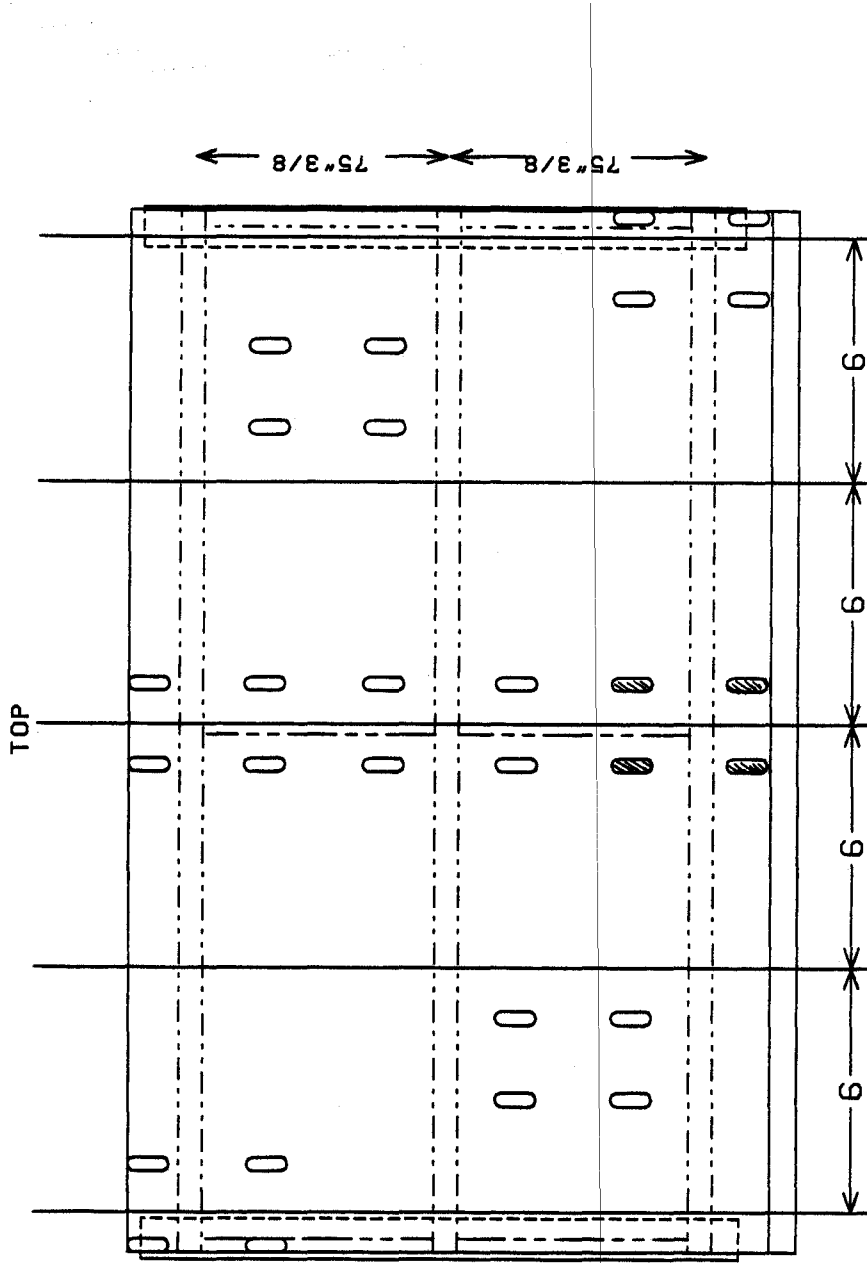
Top Cracking Pattern (Second Bridge - Test No. 4)
